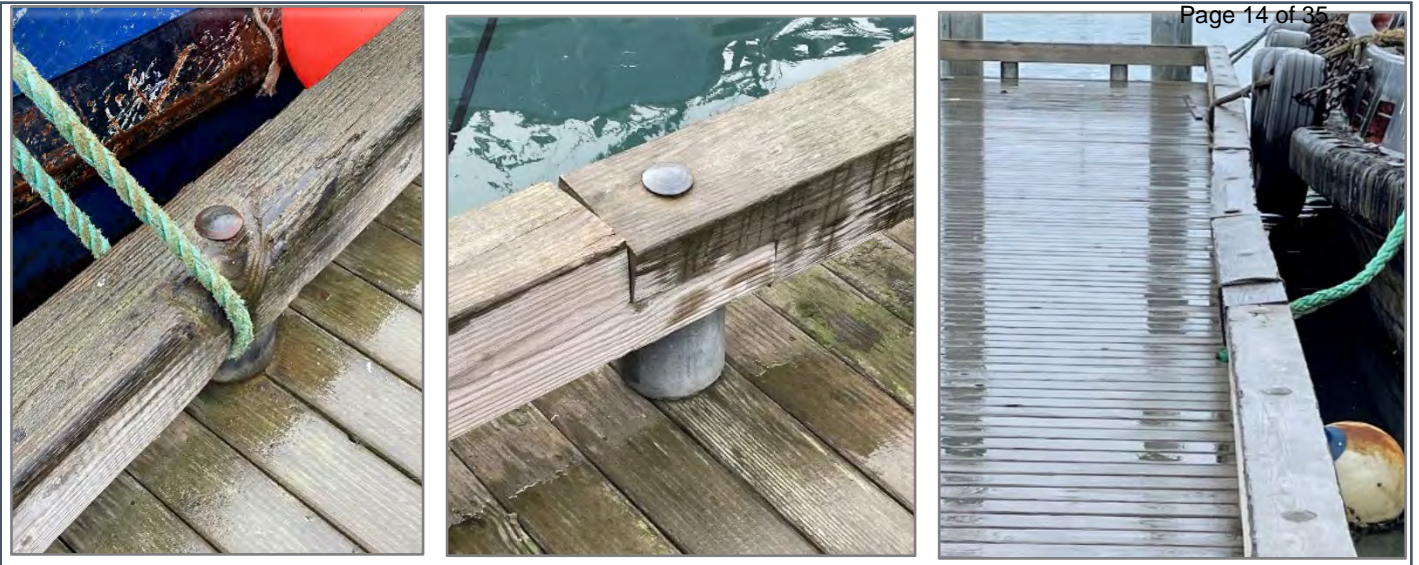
Bullrails worn, twisted out of position, and broken from supports.
